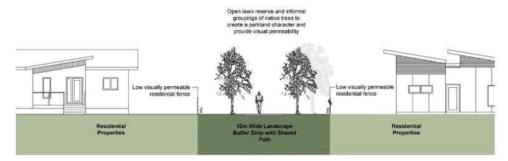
D: Cross section illustrating the 10m wide Landscape Buffer Strip with Shared Path
